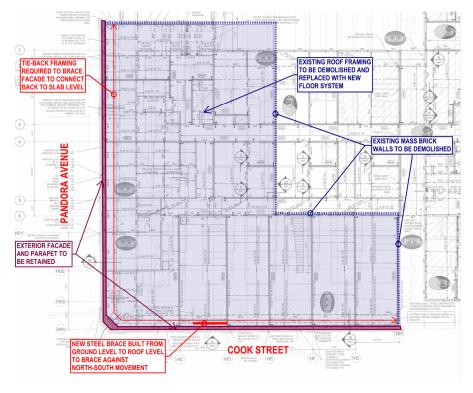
Roof Level Heritage Retention Plan (As Proposed by Developer)
